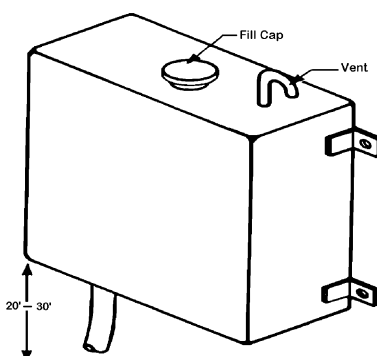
Expansion Tank With Solid Cap and Vent Tube
